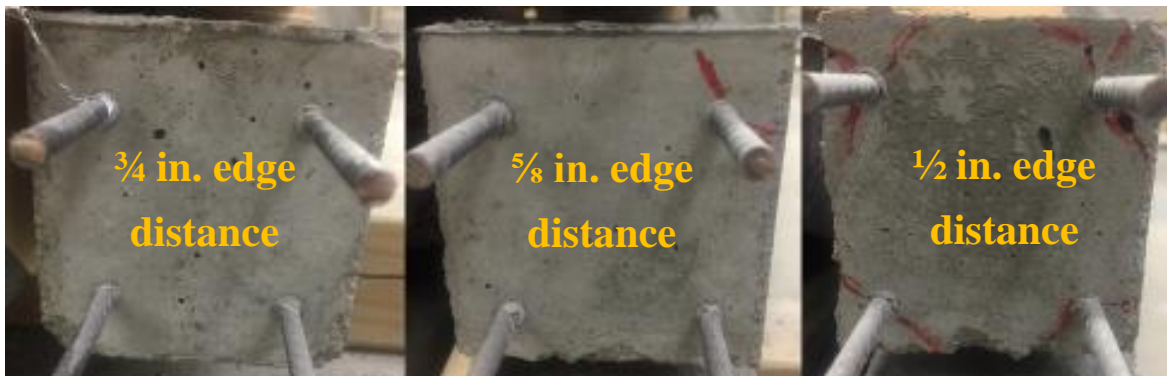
Mix#2, 4500 psi, WP-Observed Cracking (Dead End)
